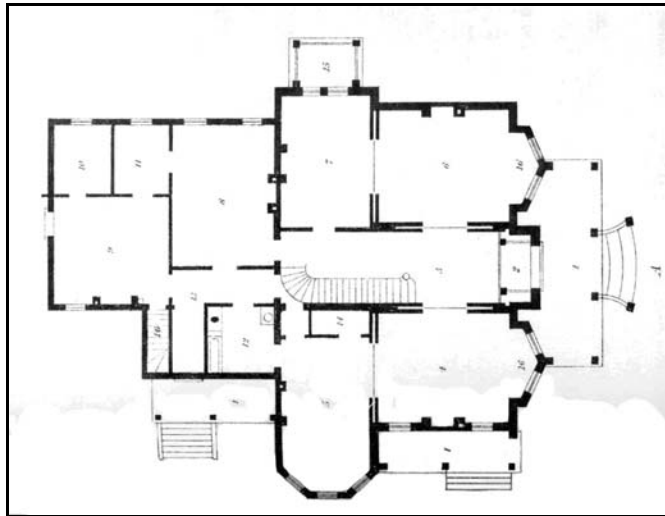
A pre-1873 house plan with four sets of pocket doors (Cummings 1873:plate 16).
